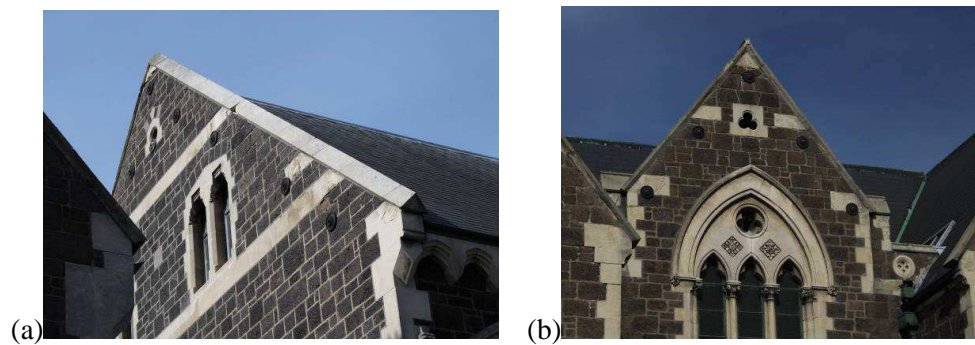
The Christchurch Arts Centre, showing successful use of wall-diaphragm anchorages
